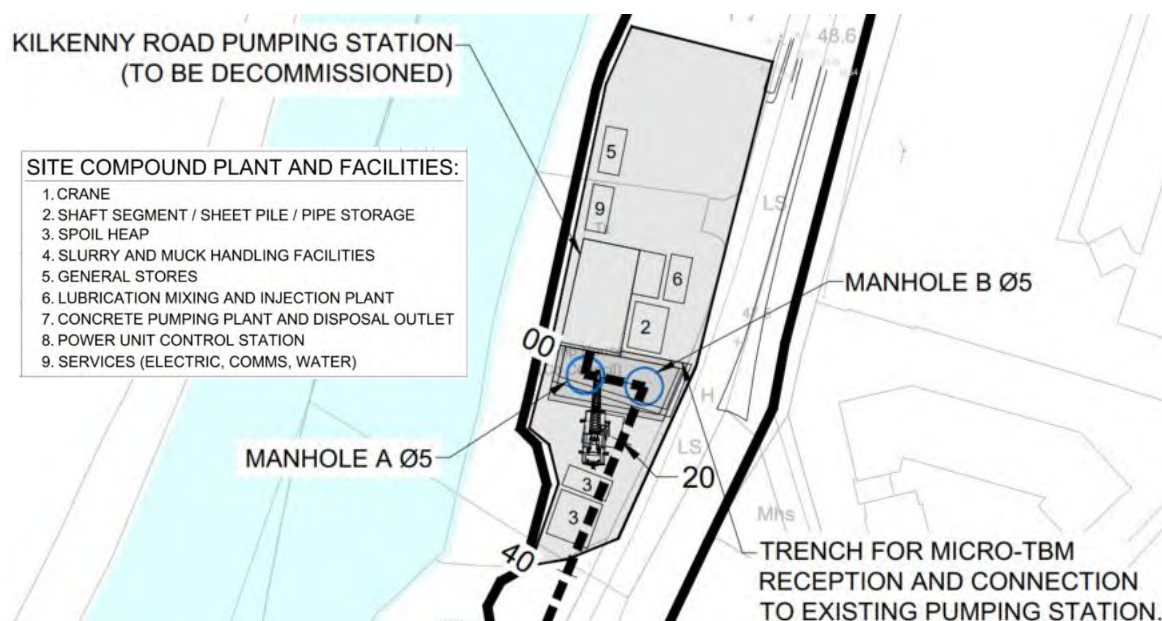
Indicative plan arrangement at the KRPS trench excavation site.
